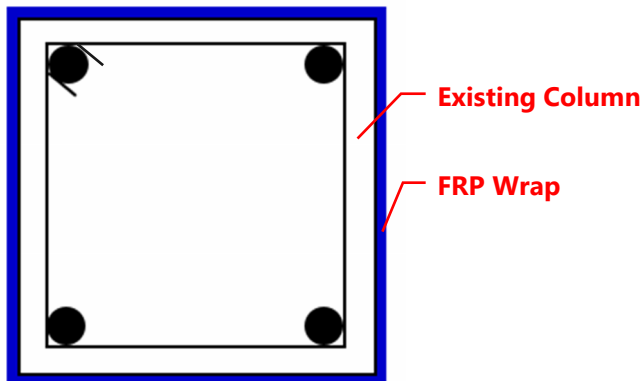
Sectional view of a reinforced concrete column which is wrapped with FRP to enhance shear strength and member deformability
